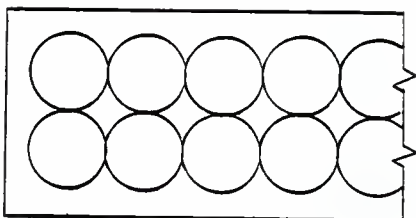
Layout of Two Bins Wide Concrete Battery
